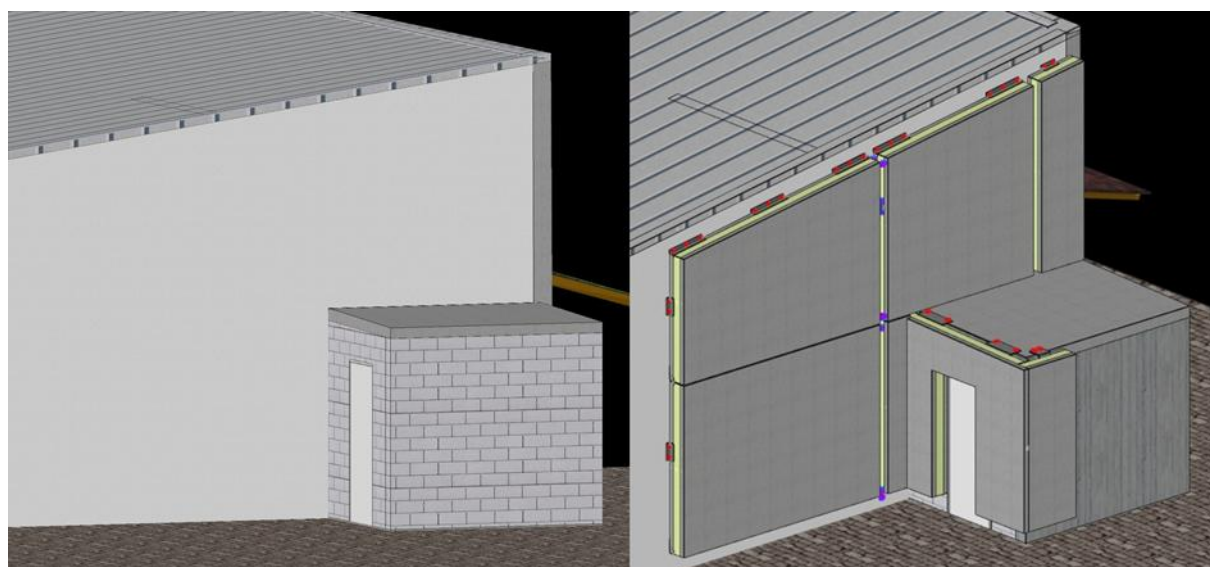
3D design of the demonstration façade – initial condition (left) and renovated with sandwich façade elements (right). Source: Uwe Schneider, KOMZET BAU Bühl
